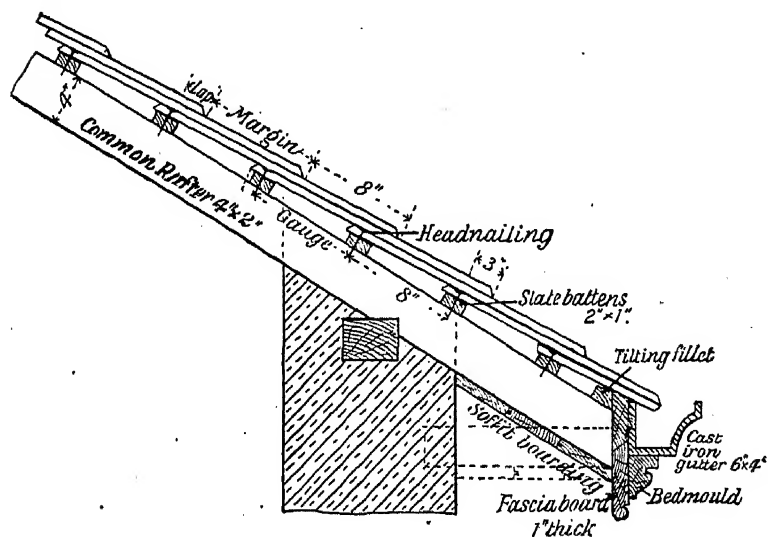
Section through the overhanging Eaves of a Roof, showing Countess Slates laid on Battens to a 3" Lap, and nailed at the head.
